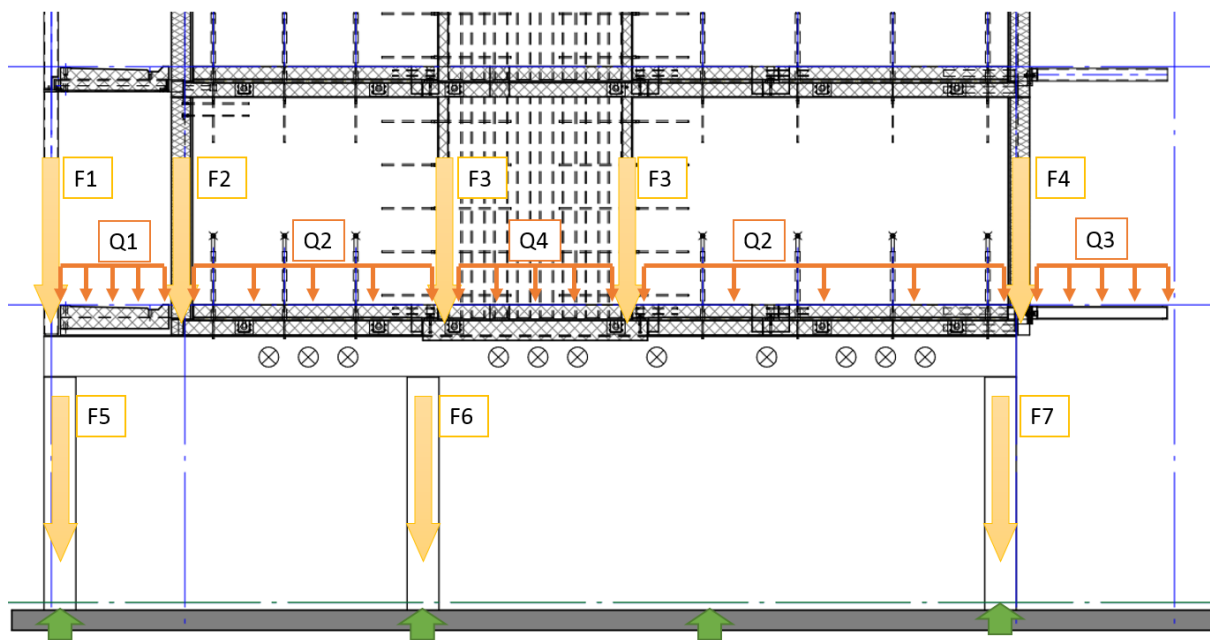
Lay-out of loads in cross-section on fictitious beam
